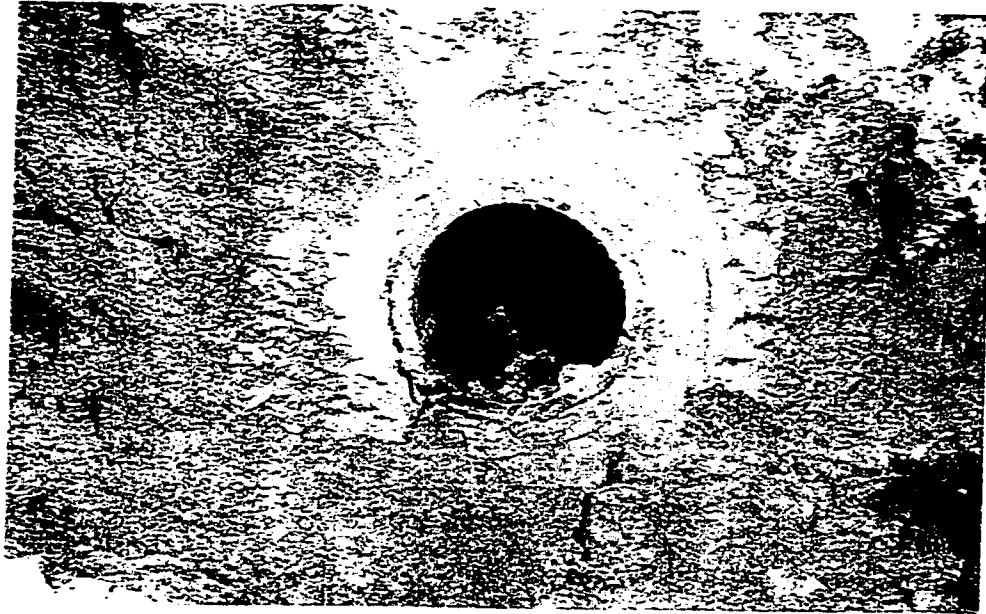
Four Week Excavation of 200mm Pipe in Clay
